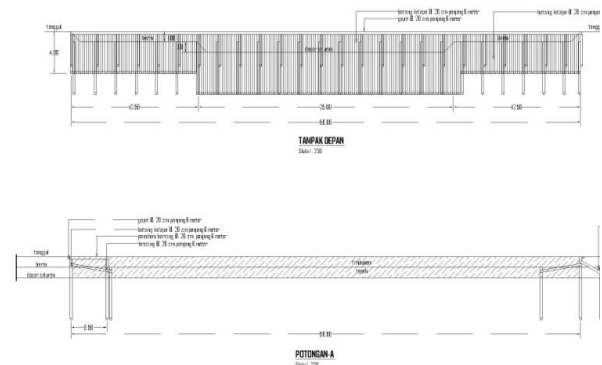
Canal-blocking design of semi-permanent using the local wood of the coconut tree with the width of the channel cross section of 50 m
